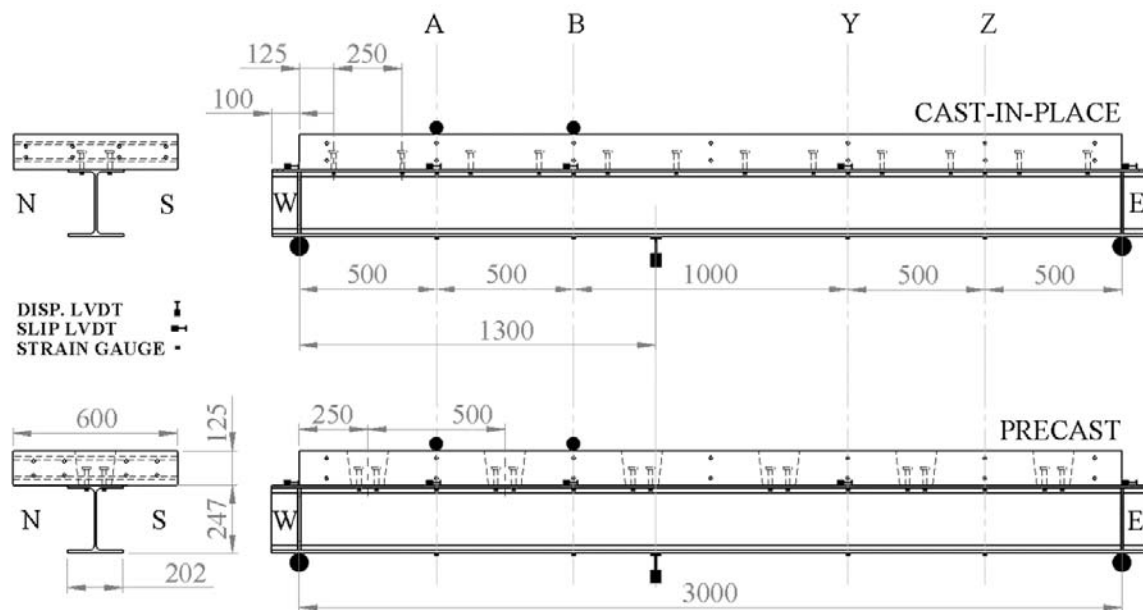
Beam specimen geometry and layout (dimensions in mm).
